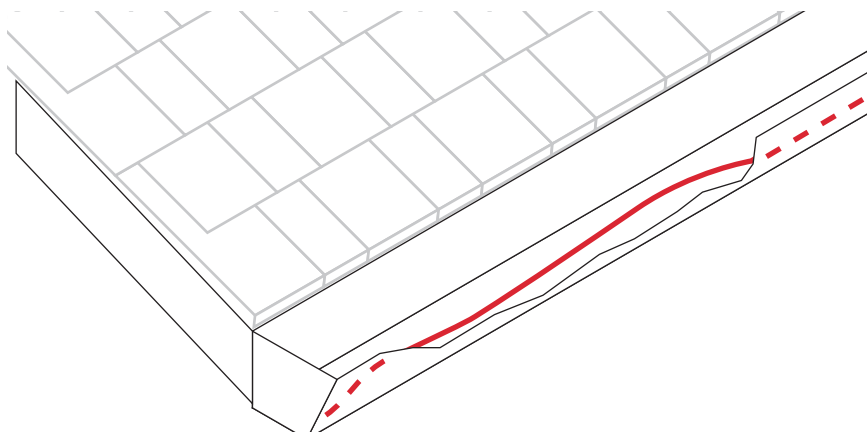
Layout in standard gutters – up to 6" (16 cm) wide
